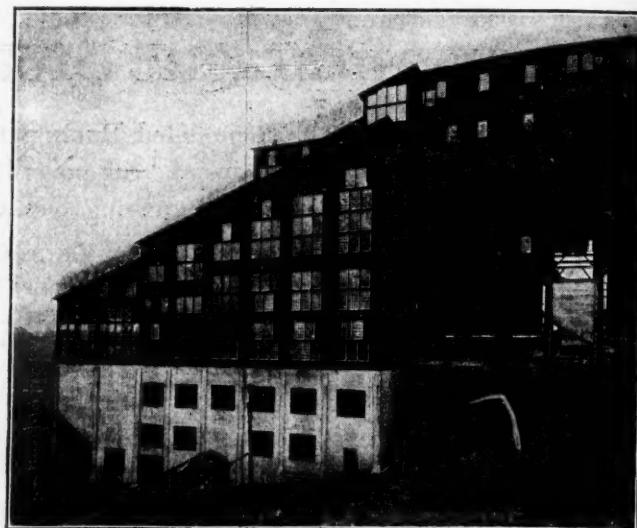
SIDE VIEW OF RECONSTRUCTED BREAKER
